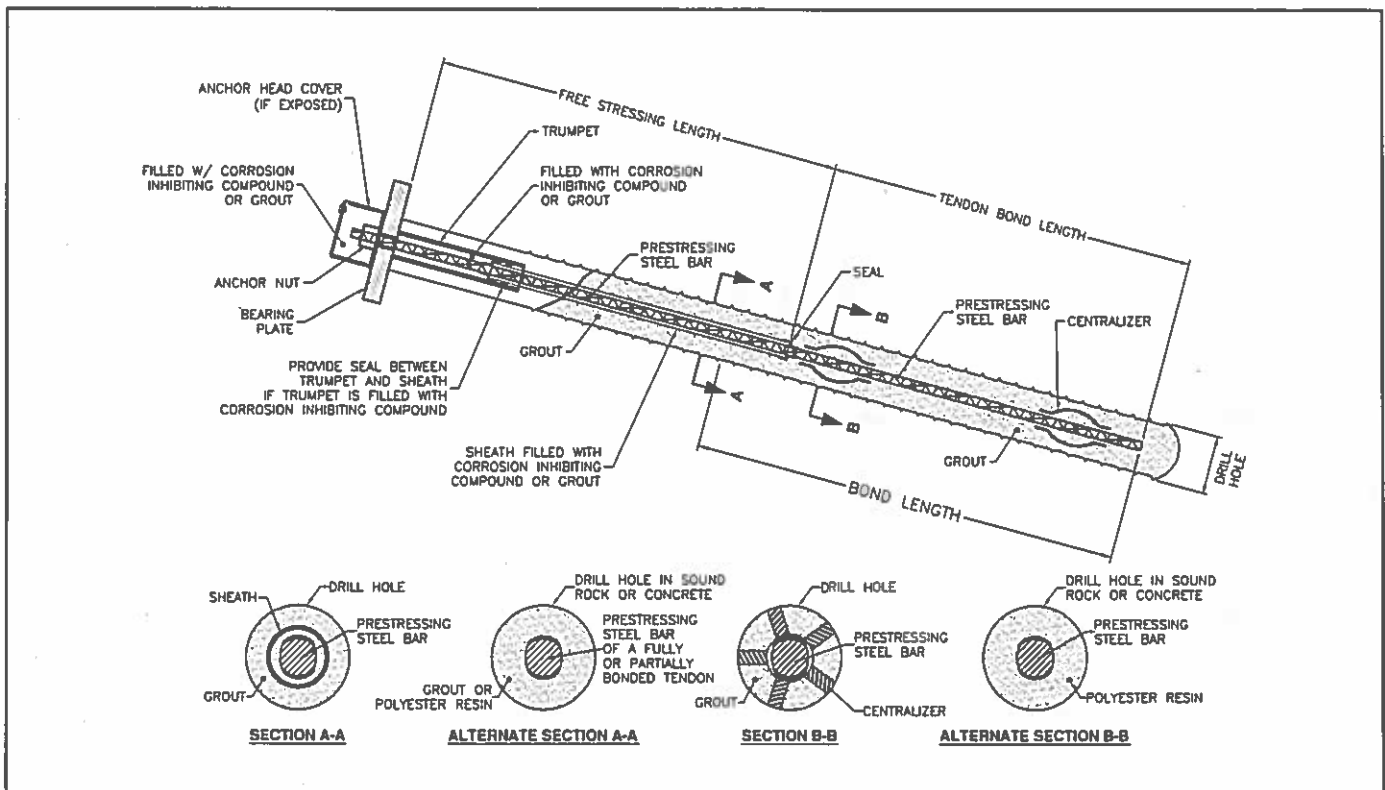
Class II protection: bar anchor. Optional: epoxy coating for enhanced protection.
